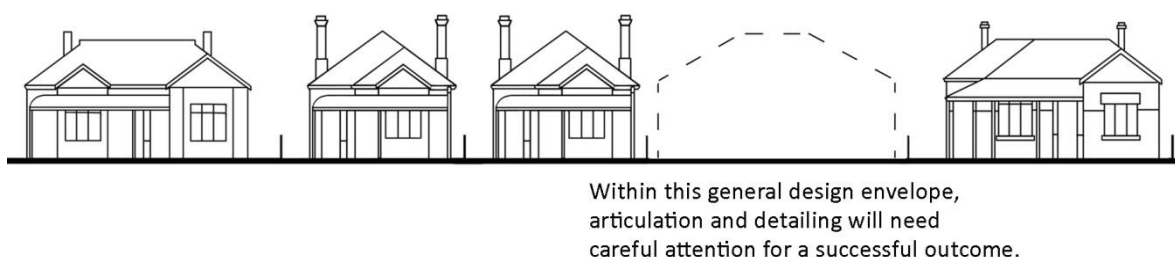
Example of a broad design envelope for a new building. Two storey wings can be included at the rear, provided these are not visible from the street in front of the house.
